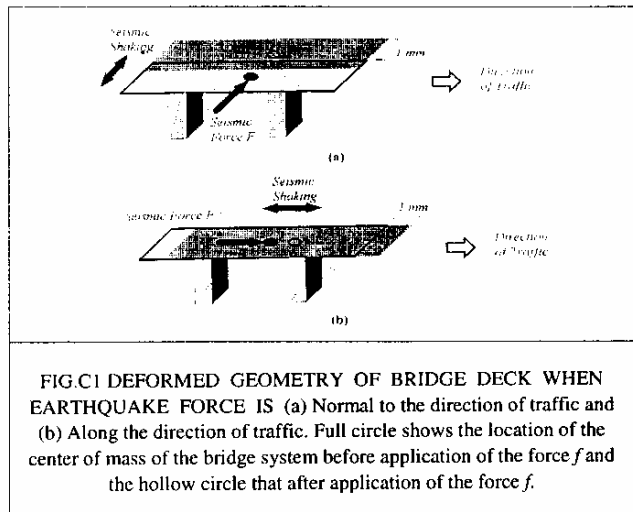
DEFORMED GEOMETRY OF BRIDGE DECK WHEN EARTHQUAKE FORCE IS (a) Normal to the direction of traffic and (b) Along the direction of traffic. Full circle shows the location of the center of mass of the bridge system before application of the force f and the hollow circle that after application of the force f .
